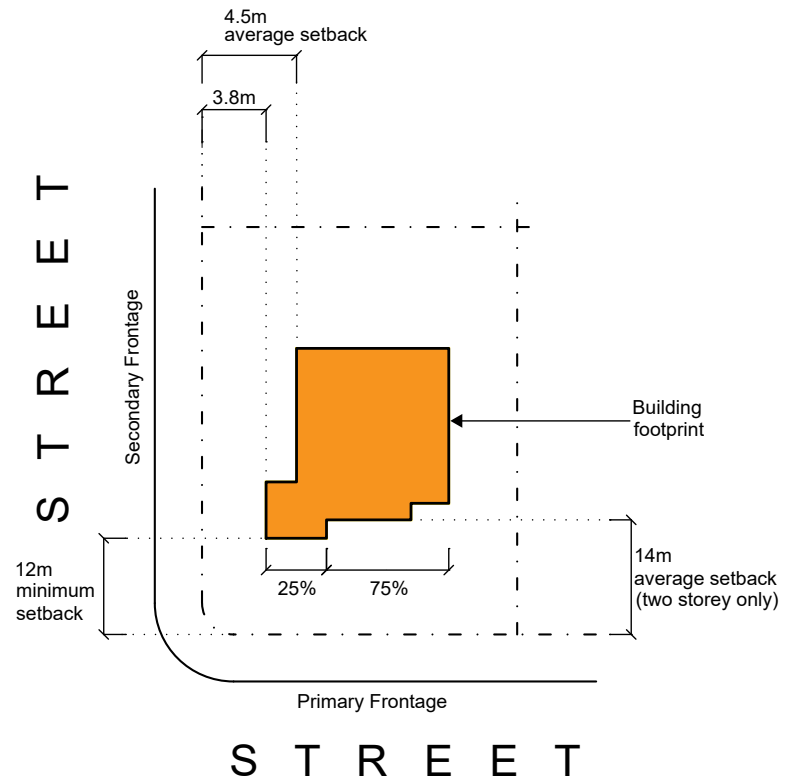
A.2-5: Setback for corner sites of a two story house on the high side of the street
